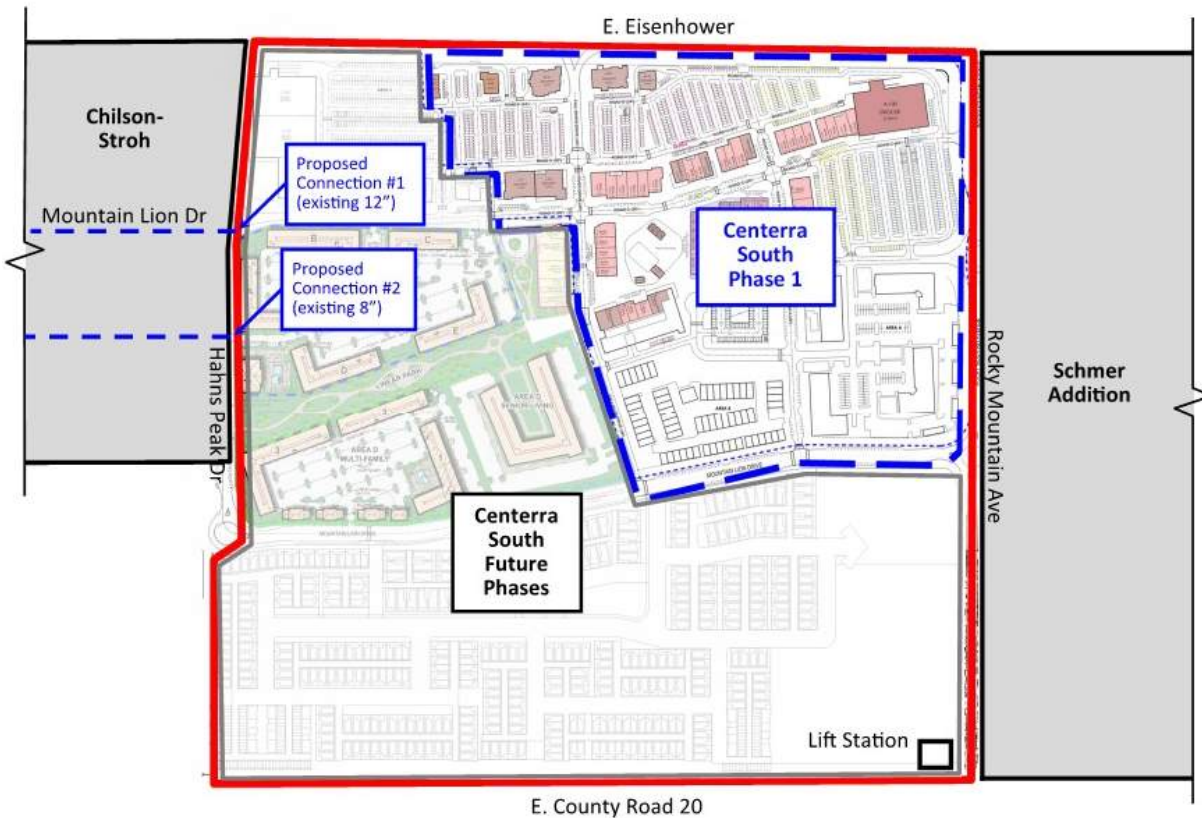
PROPOSED WATER CONNECTIONS
